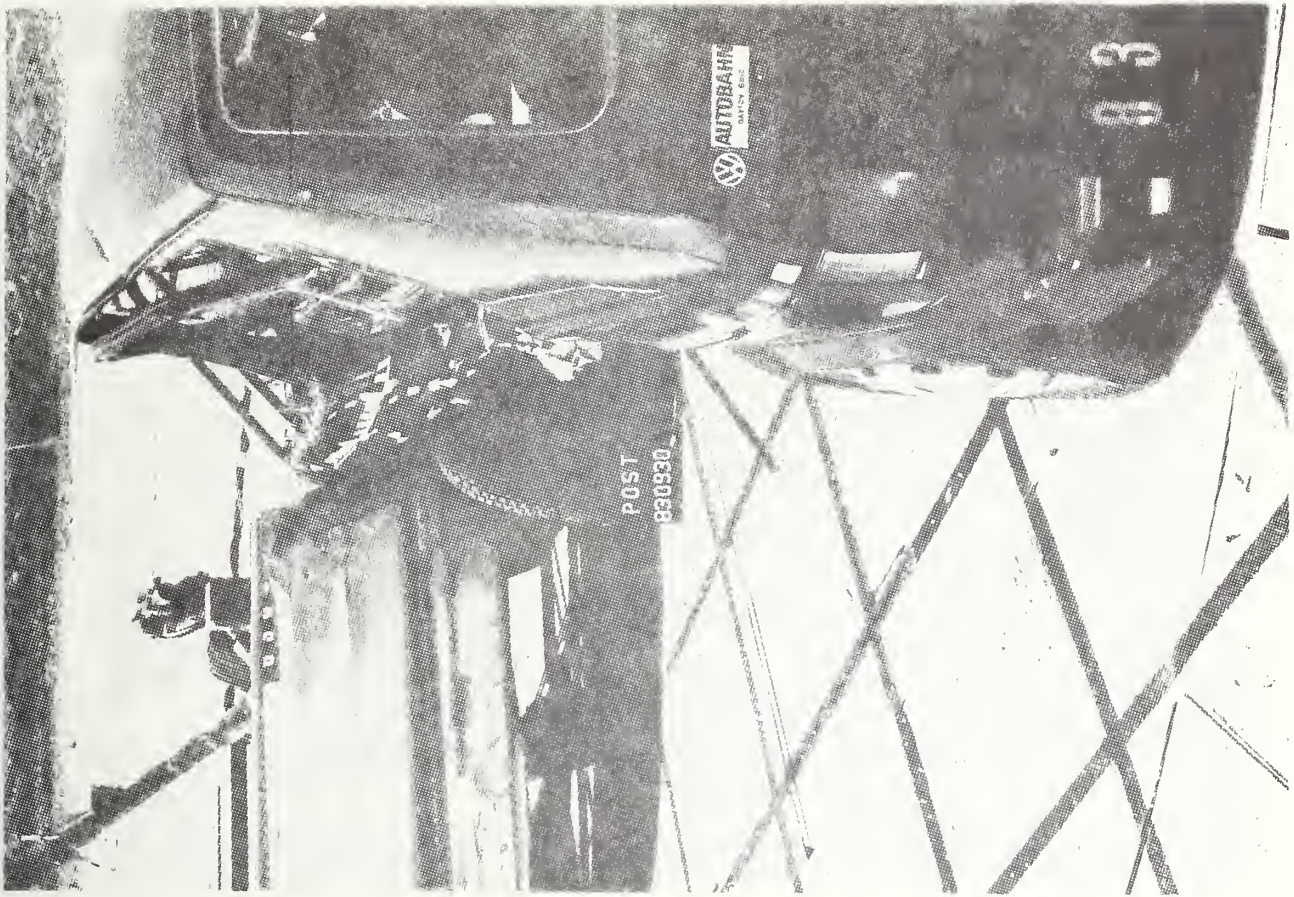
POST-TEST CLOSEUP - VIEW 1
